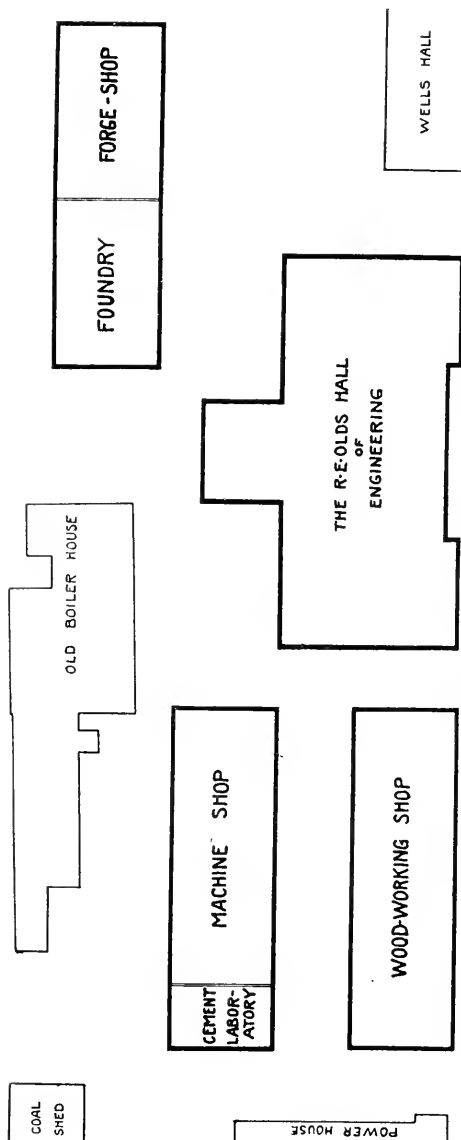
LOCATION OF THE NEW ENGINEERING BUILDINGS IN RELATION TO OTHER COLLEGE BUILDINGS.
